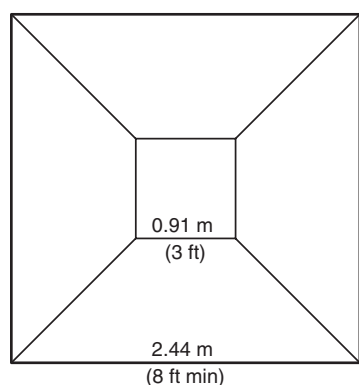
(b) Plan View of Canopy Head.
